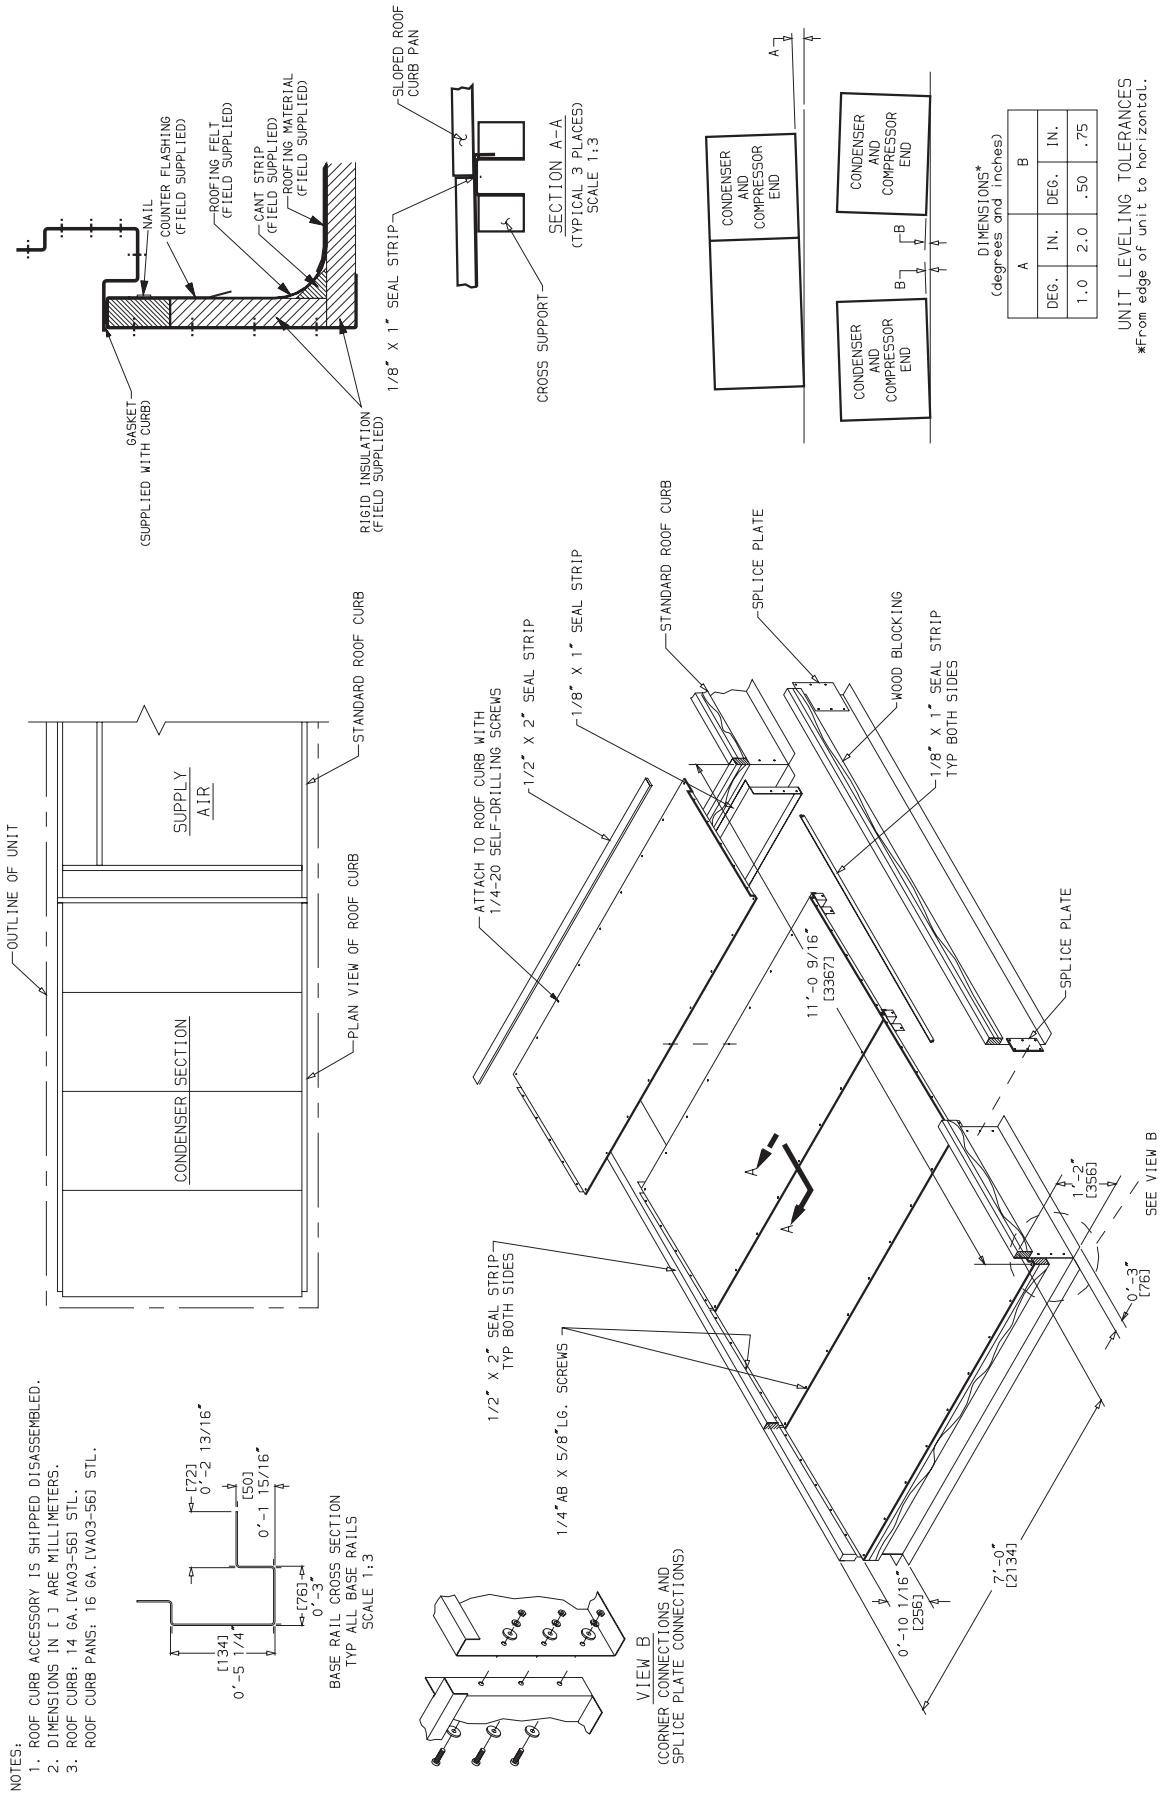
Condenser Section Roof Curb (Size 070-105 Only)
